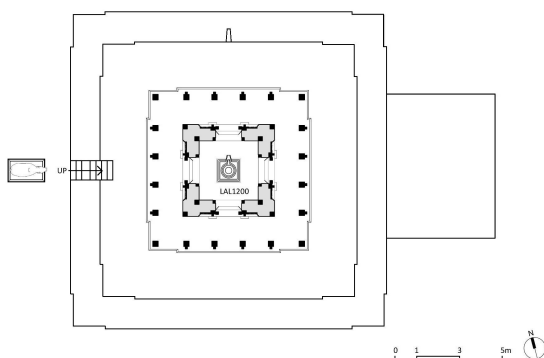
Proposed Plan of Bhaidega Temple (Source: KVPT)
